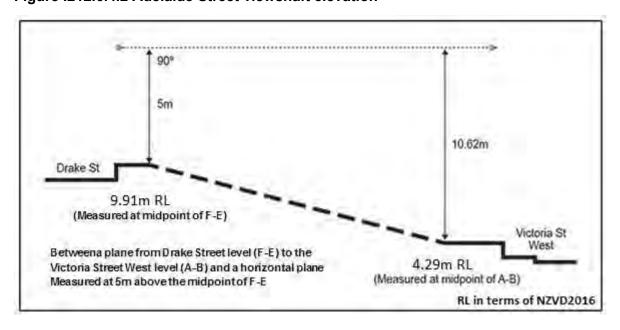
Adelaide Street viewshaft elevation
